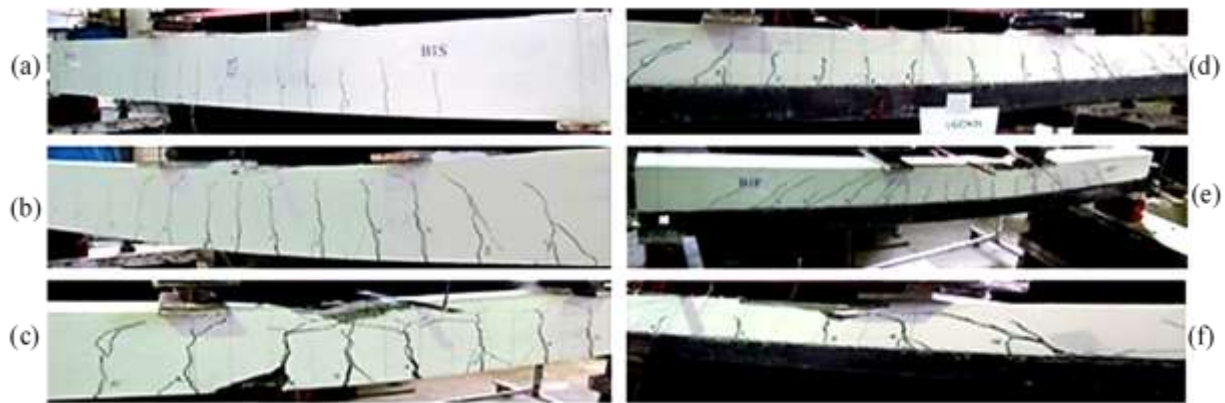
Cracking and failure sequence of Group II beam specimens (a) Beam B1S at yielding stage (b) Beam B1S at ultimate stage (c) Beam B1S at failure (d) Beam B1F at yielding stage (e) Beam B1F at ultimate stage (f) Beam B1F at failure stage
